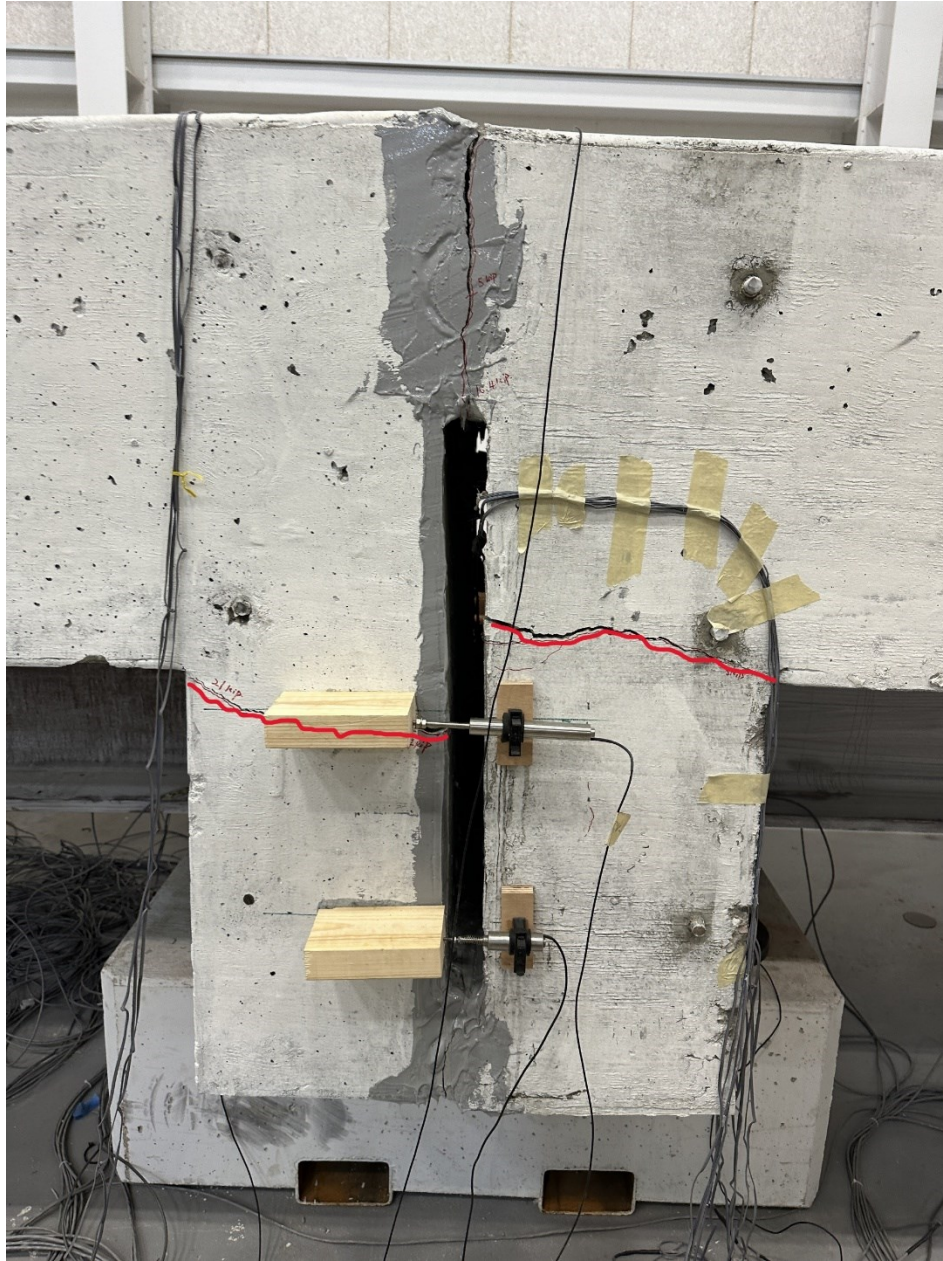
View of Cracking on South Side in Match-Cast Joint.
